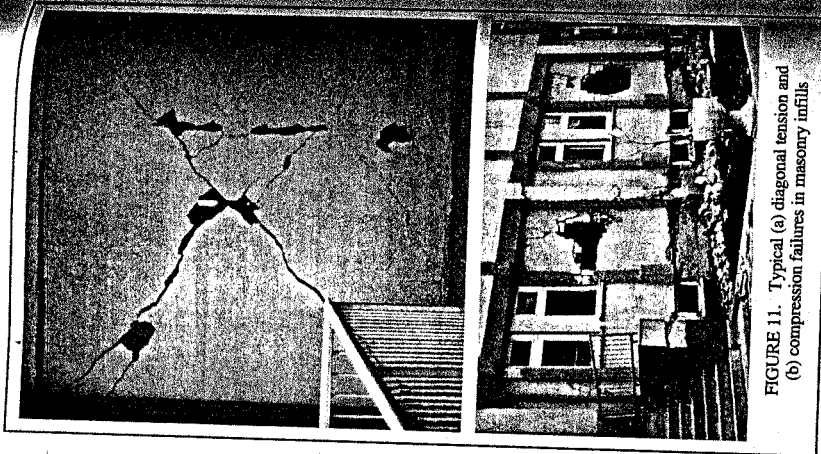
(a) Typical diagonal tension and (b) compression failures in masonry infills
